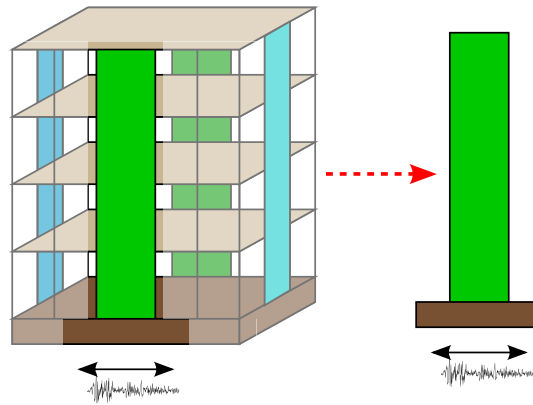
Isolation of the wall element from the real structure (modified from DAZIO ET AL. (1999)).
